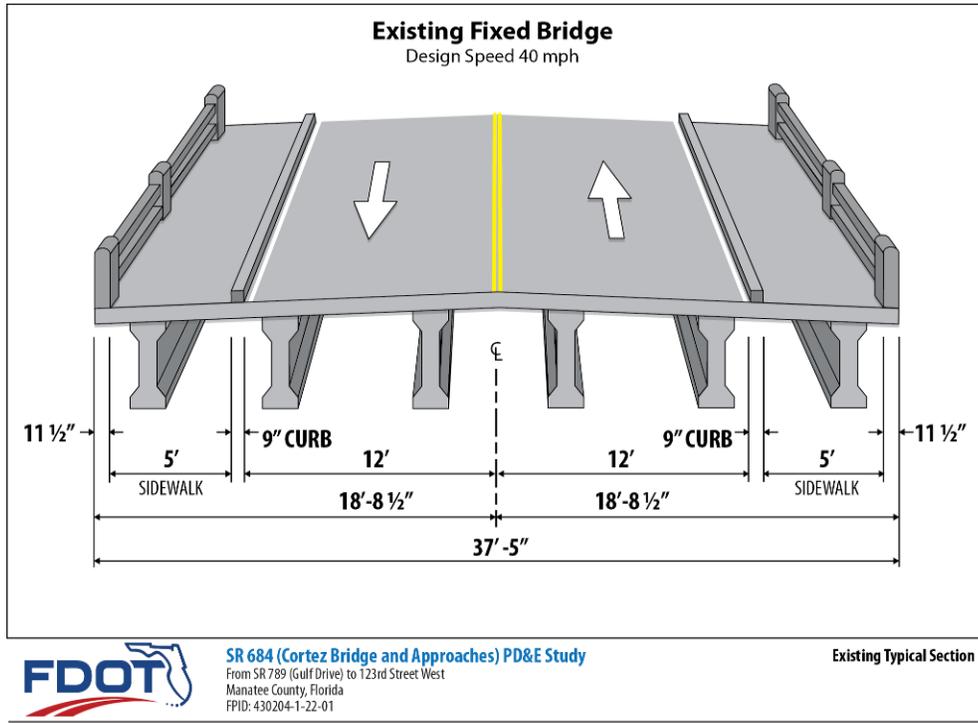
Existing Bridge Typical Section of Fixed Spans.
